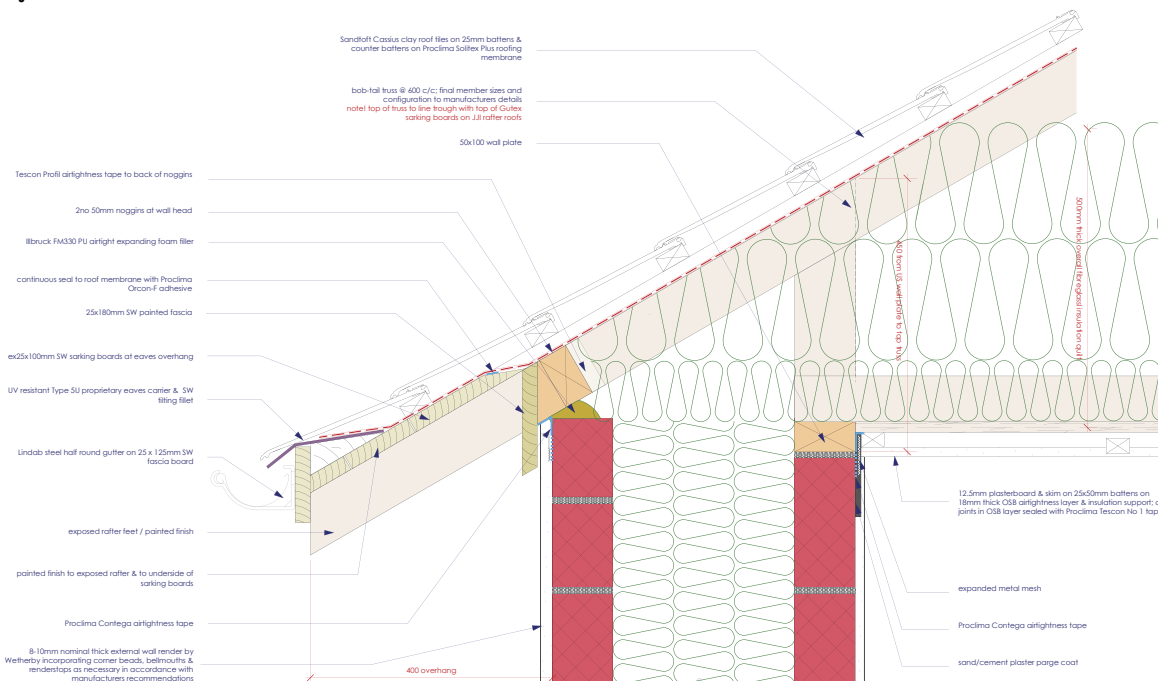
Detail cross section of the 350mm JJI roof rafter junction with the wall head.
